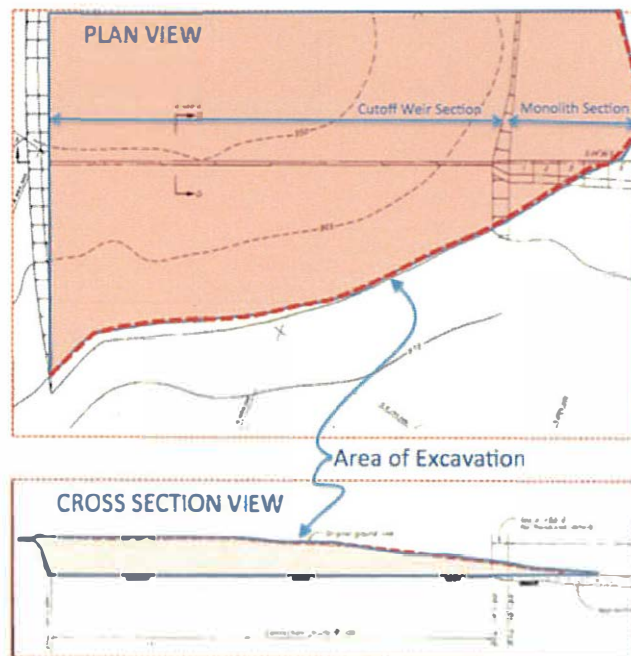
Plan and Section showing the original 1960's Emergency Spillway Excavation
